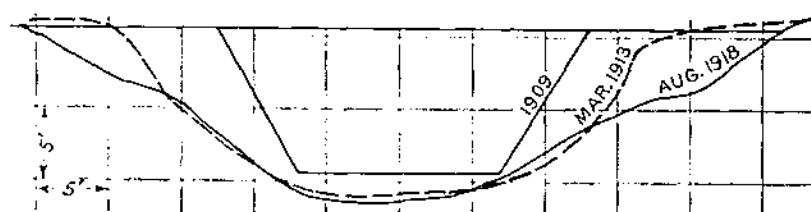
Cross section of Coonewath Creek, near Shannon, Miss.
